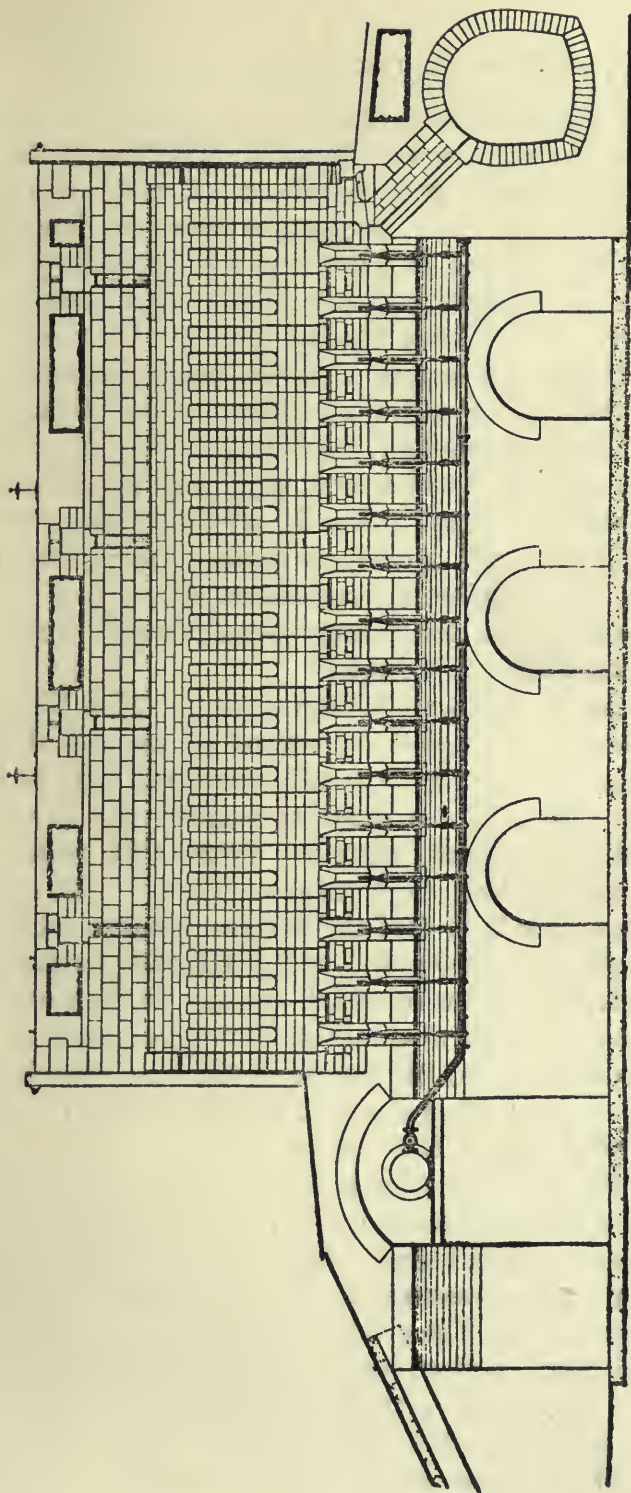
Section through Wall of Otto Waste Heat Oven.
